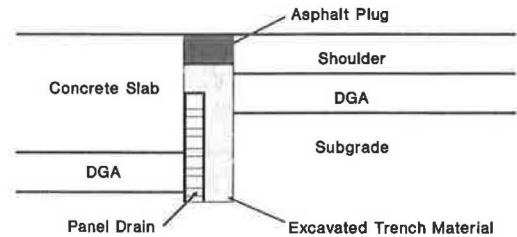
Excavated Type-A drain on I-64, Franklin County.
